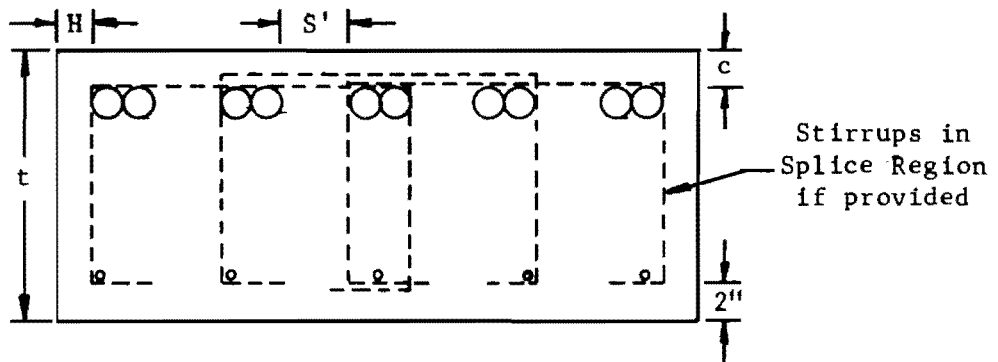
Typical cross section of #14 bar specimens (shown in testing position)
